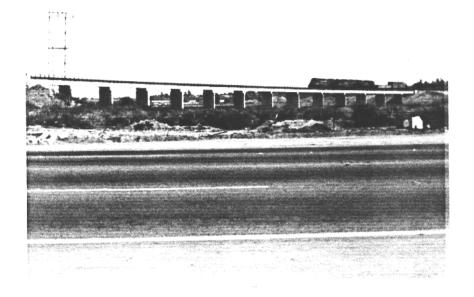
Railroad Crossing Lytle-Cajon Drainage At Highland Avenue Looking South With Island Levee At Right Embankment.
